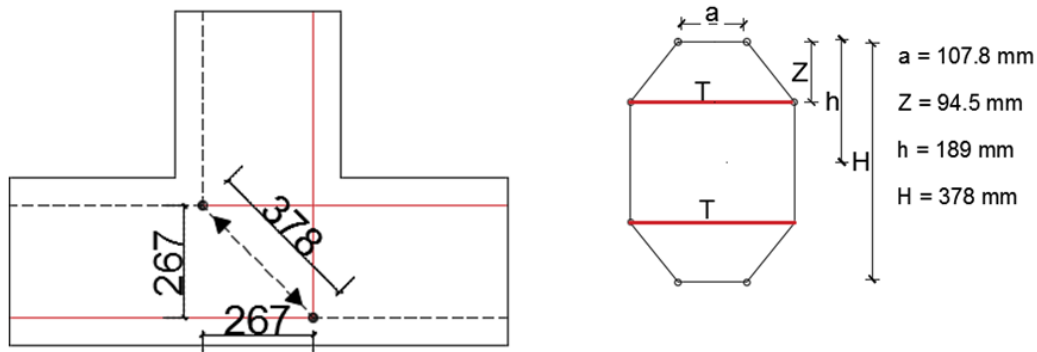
Dimensions of the bottle-shaped strut BE
